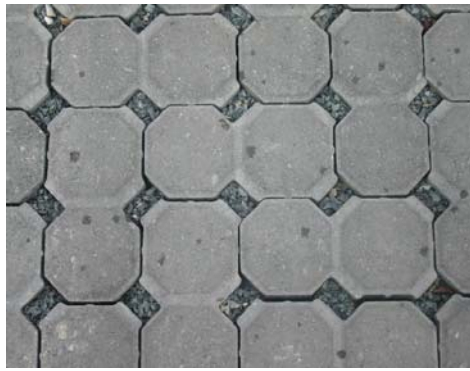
Permeable Interlocking Concrete Pavers (PICP)
